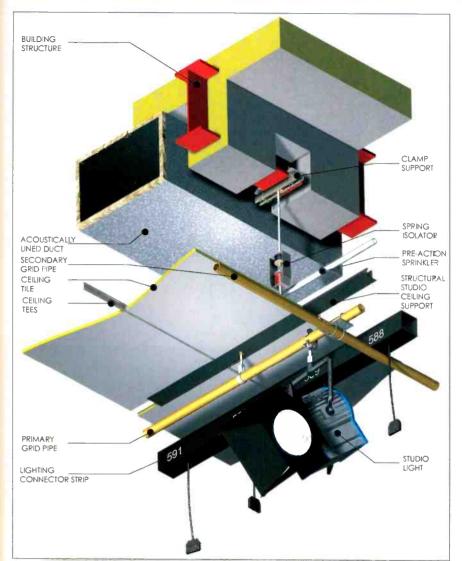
The ceiling system in the new studio incorporates a series of Unistrut supports anchored to building steel with spring isolators. The design provides some acoustic separation to the floor above and a place to attach the lighting grid.
